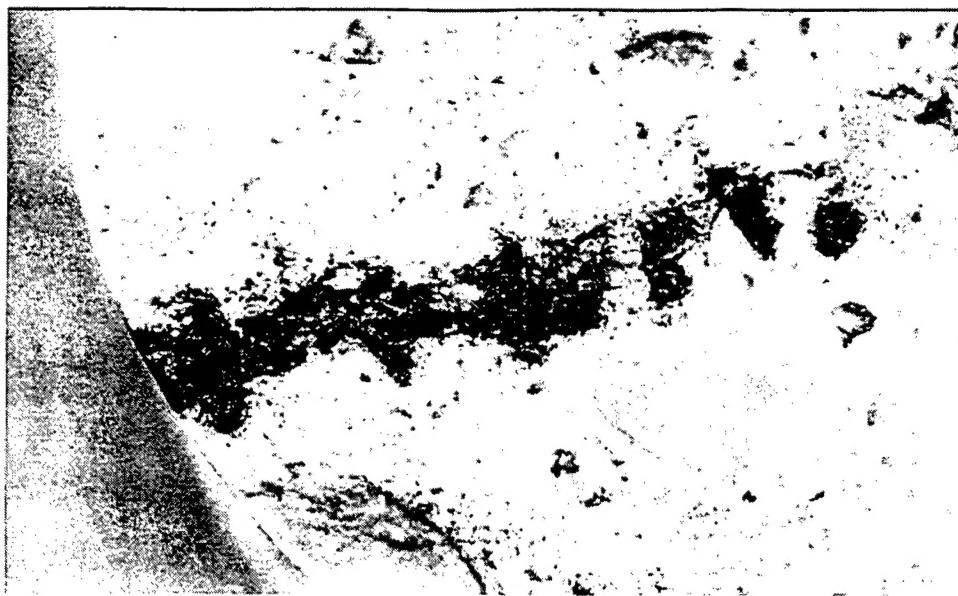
Core Sample No. T-5-1A. View of core bottom surface showing steel reinforcing-bar impression coated with steel corrosion by-product
